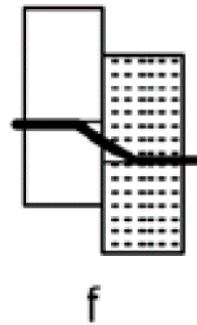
Failure mode (f) for laterally loaded nails in single shear.
